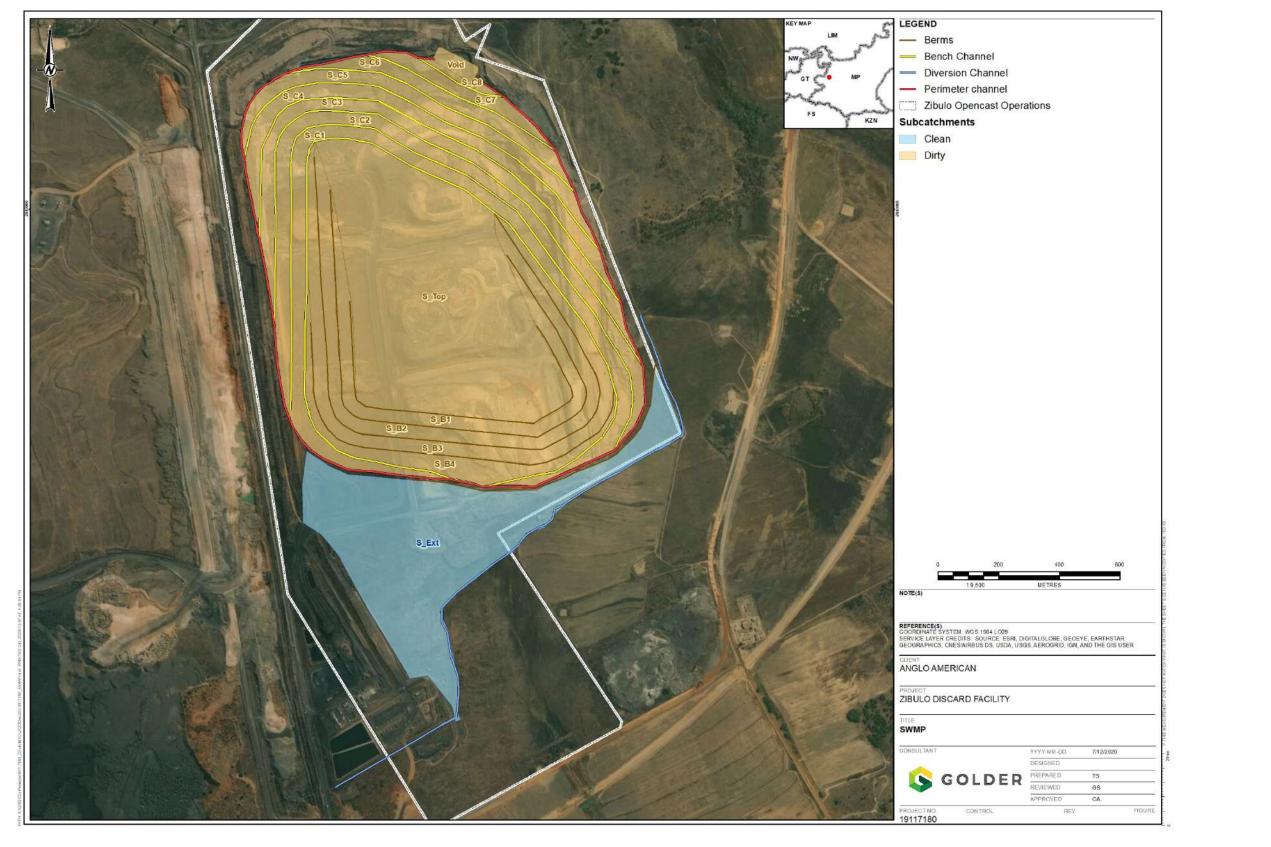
Zibulo Discard Facility Stormwater management plan layout
